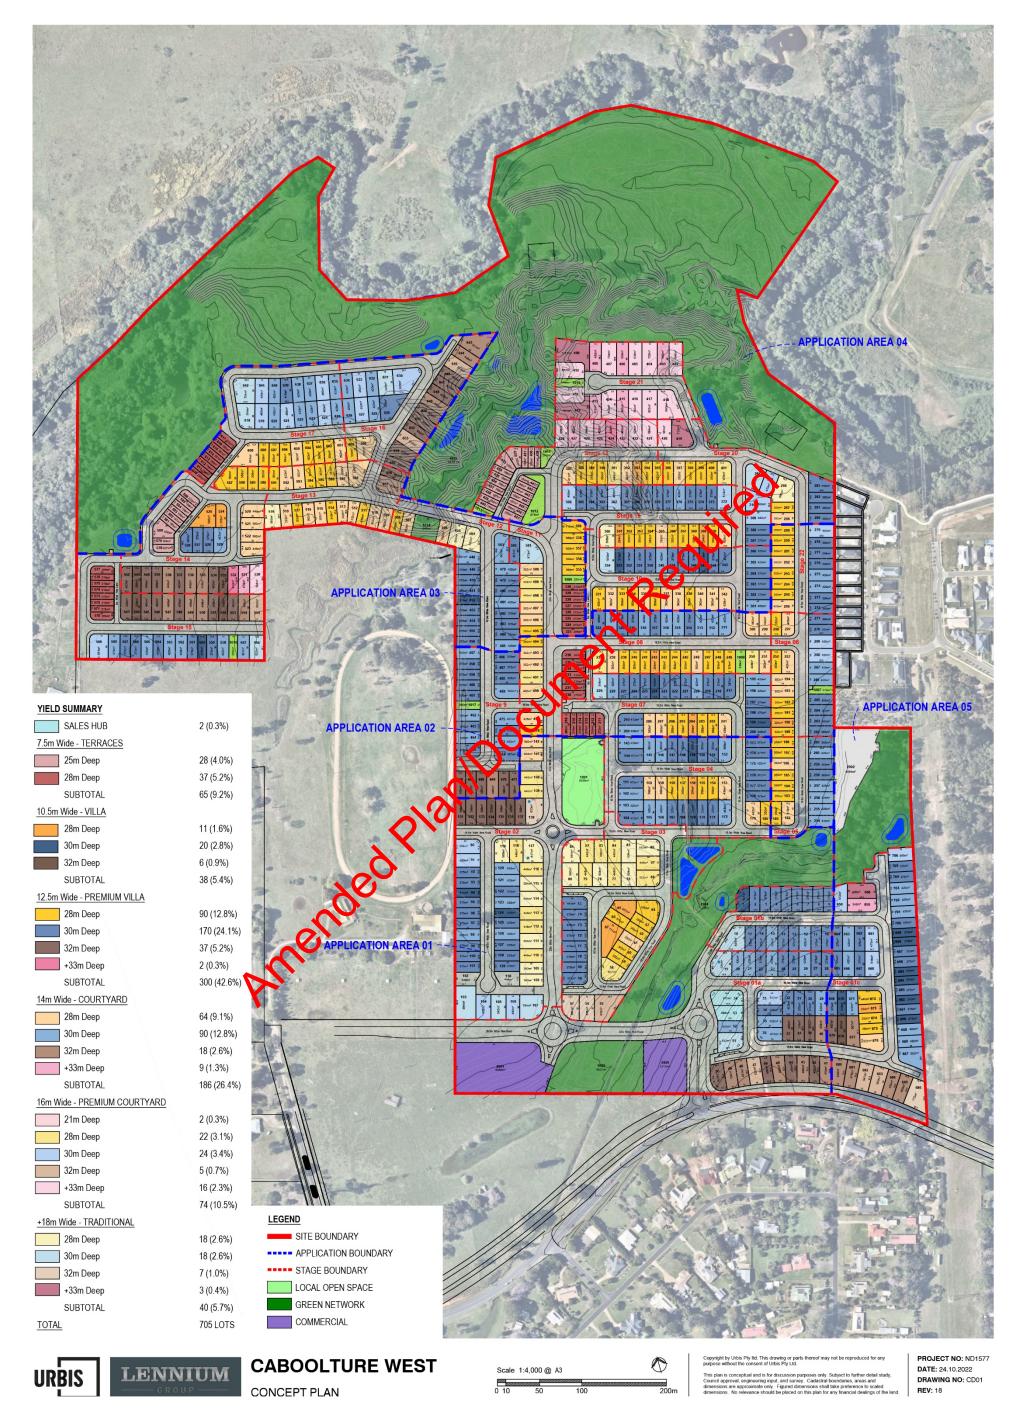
A – Concept Plan (Stages 01a, 01b, 02, 03 and 04 Shown Outlined in Blue)
